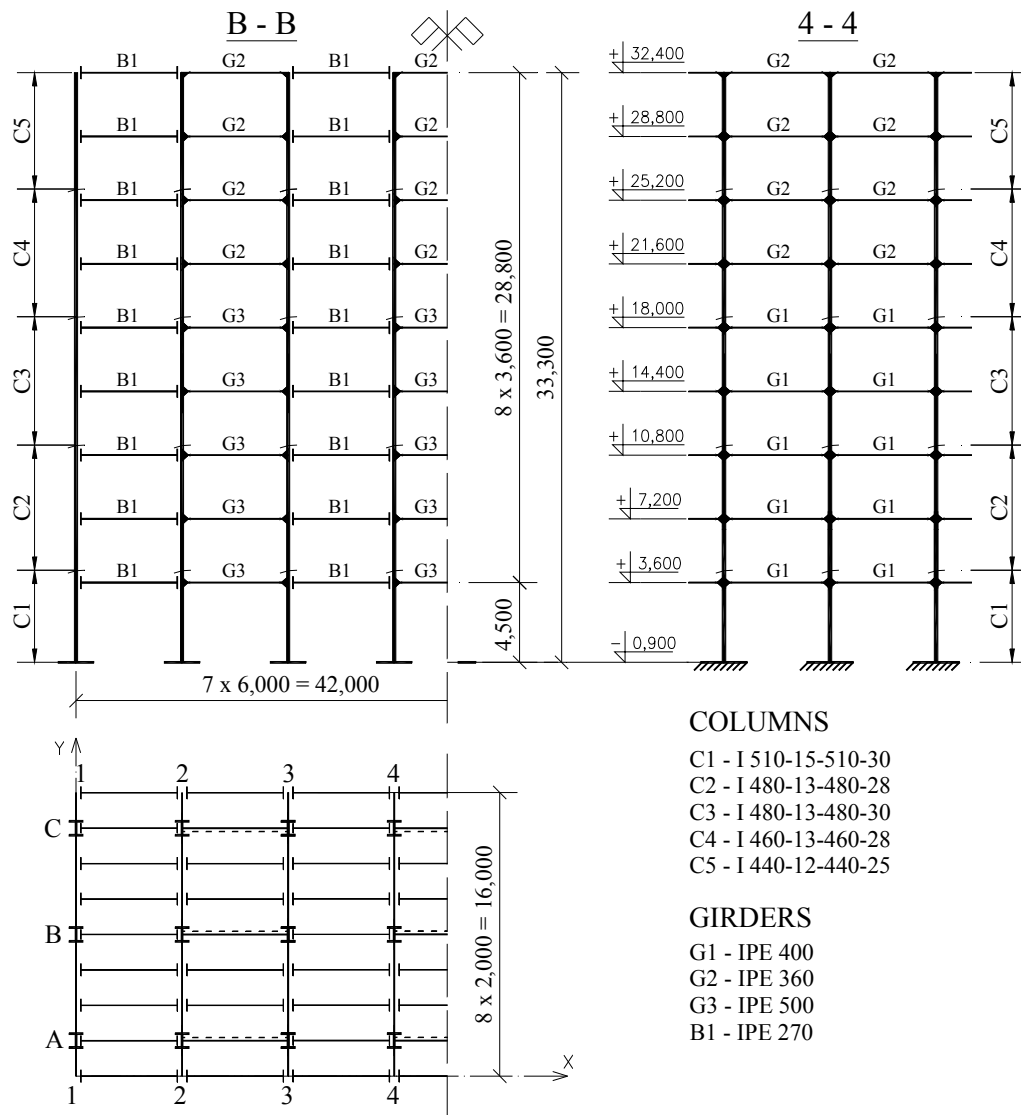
Analysed Skeletal Framed Steel Structure – Building B2 (9-Story)
